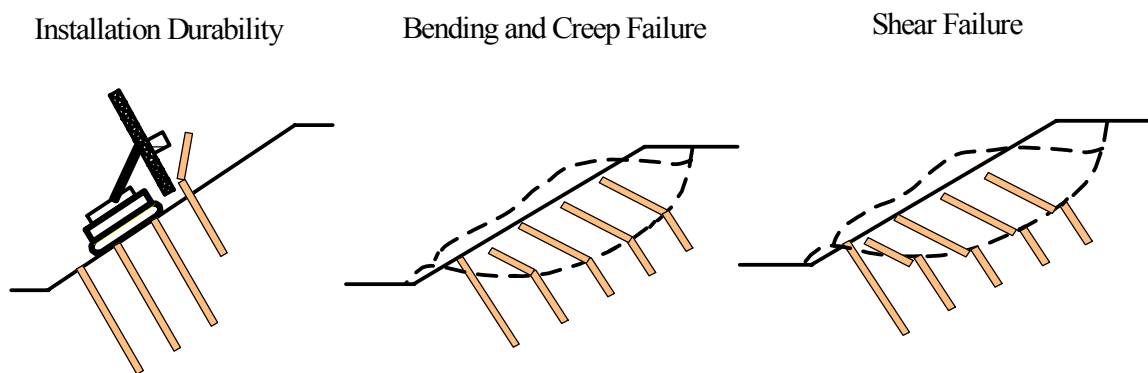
Three potential modes of failure for reinforcing members in slope stabilization applications.
